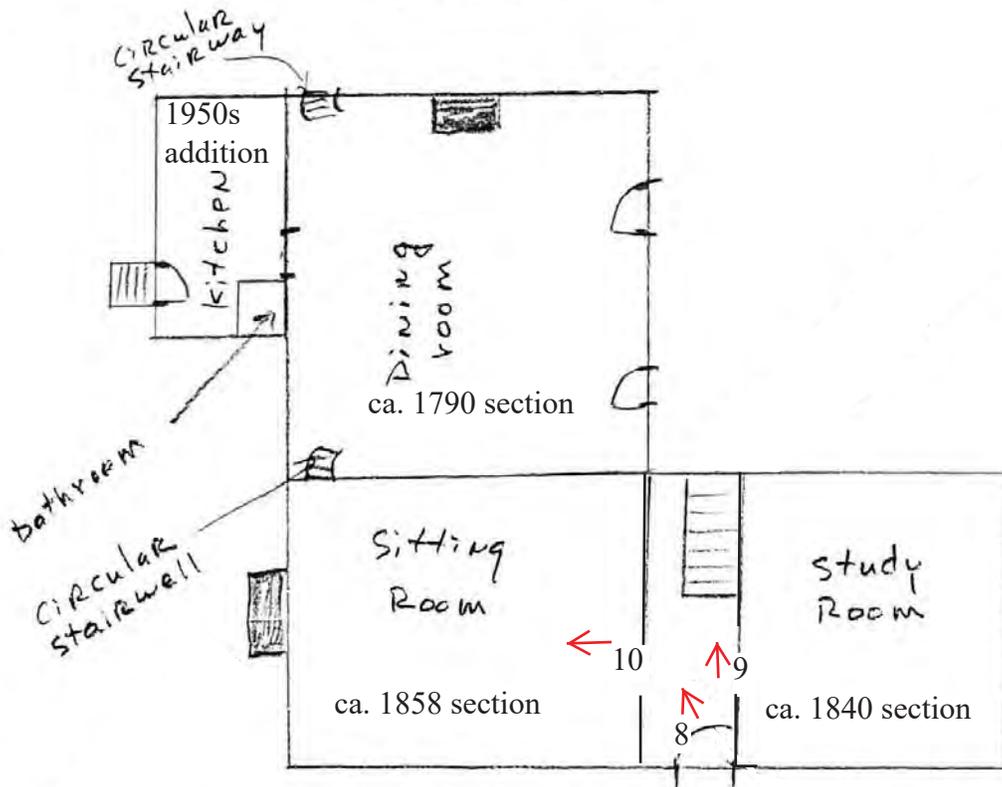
PHOTO KEY AND FLOOR PLAN - PRIMARY DWELLING
